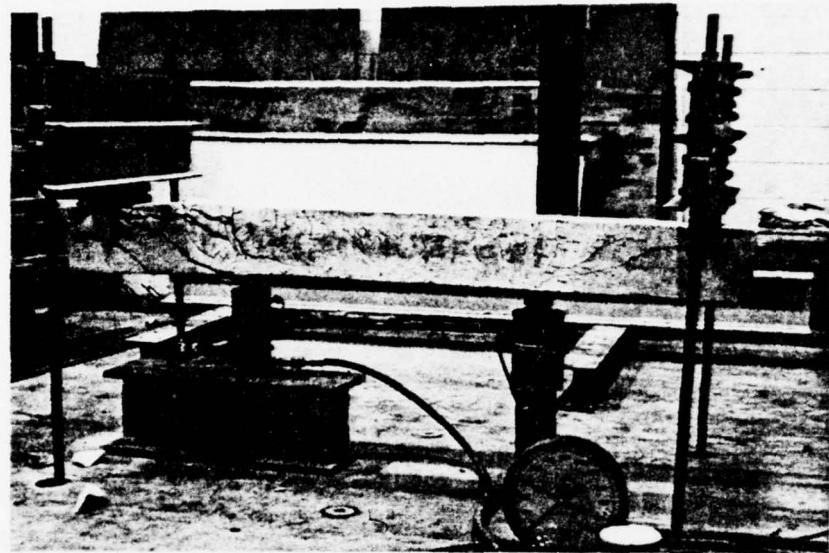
Bond Failure of T-1-E. Splice Length = 12 inches. Failure Moment = 22.3 kip-ft.
